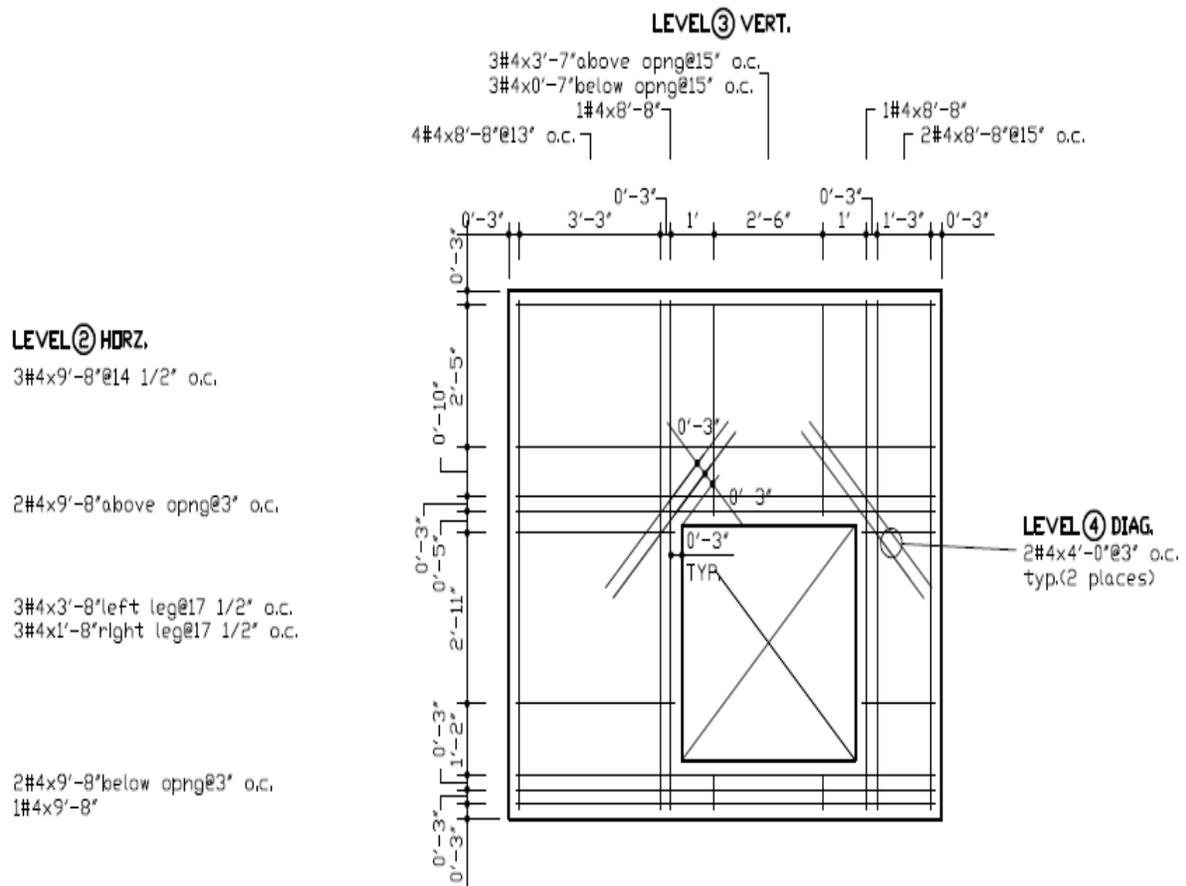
Steel reinforcement design (Abi-Nader 2010)
